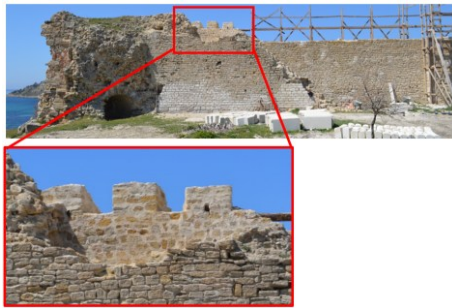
Northwest wall shows earlier crenellation from 17th century (2016)
